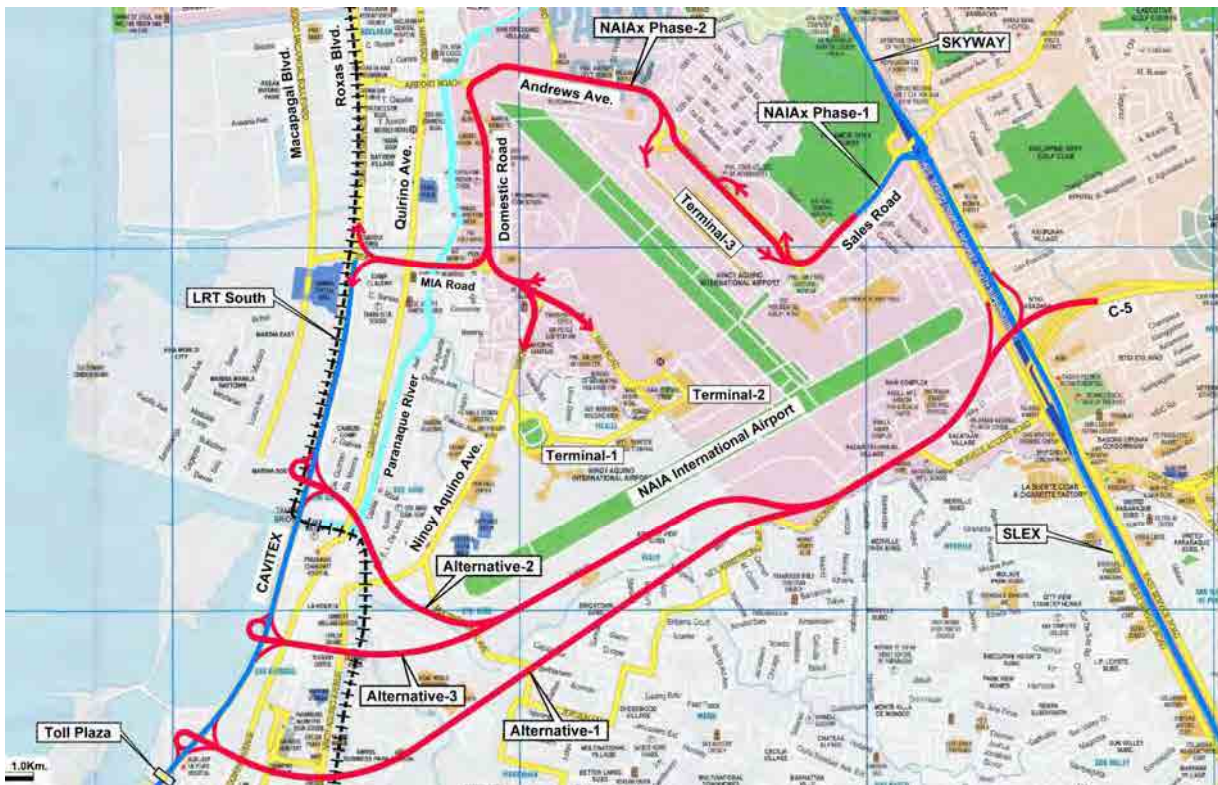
C-5 EXTENSION ALIGNMENT ALTERNATIVES
